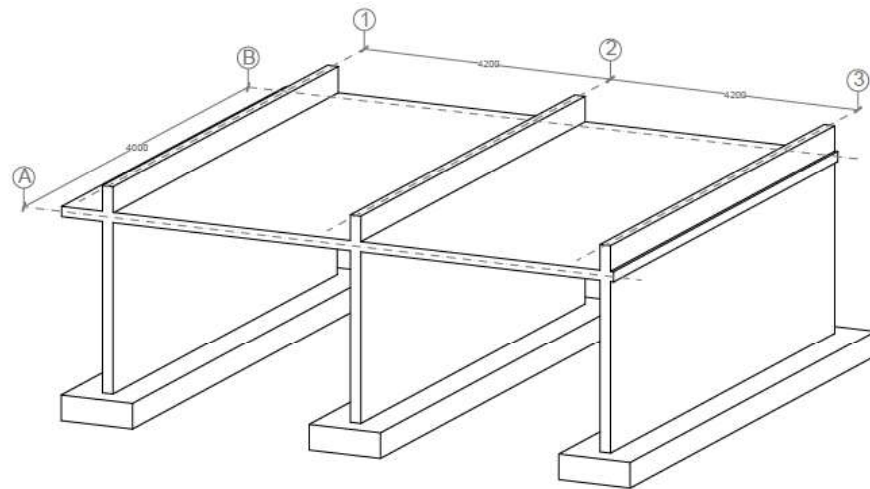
Isometric view of the specimen EUC-BUILD-3 (adapted from [Brunesi et al, 2017]).
